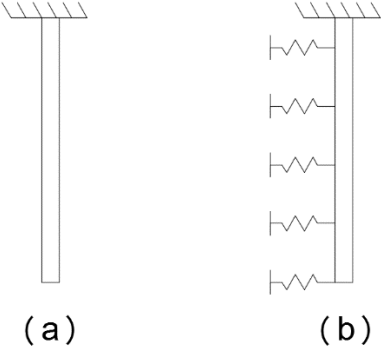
(a) The backwall behaves like a cantilevering beam when subjected to large loads in weak soil. (b) The backwall behaves like a beam on spring supports when subjected to loads in stiff soil.
